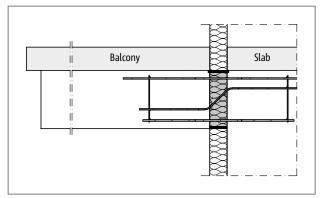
Schöck Isokorb® XT type B: Balcony construction with freely cantilevered downstand beams (prefabricated balcony)
